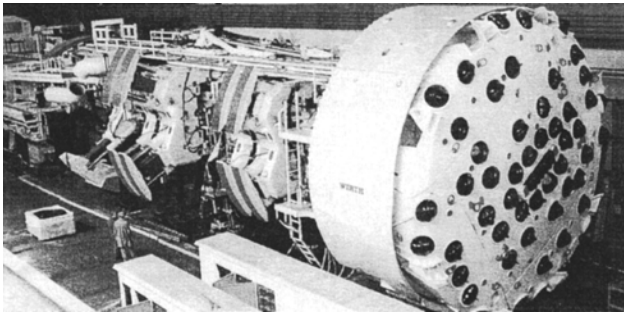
Gripper tunnel boring machine in factory (courtesy of Wirth GmbH)
